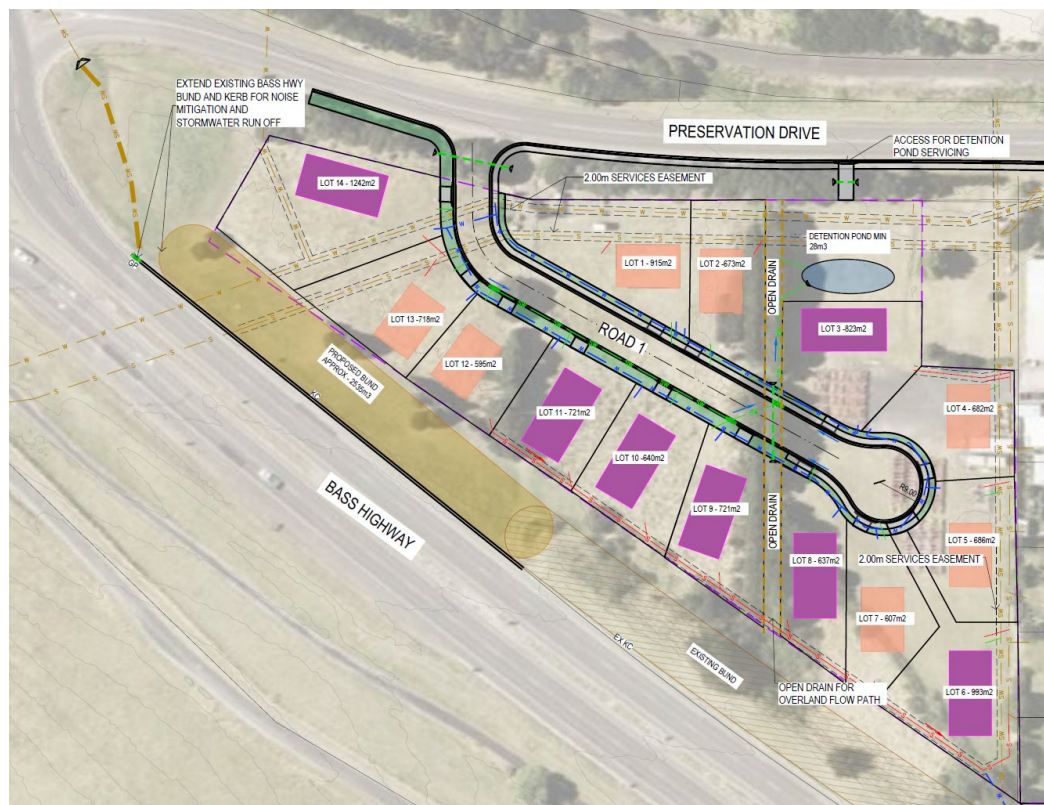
Concept site plan for residential subdivision (Source: Flussig Engineers)
